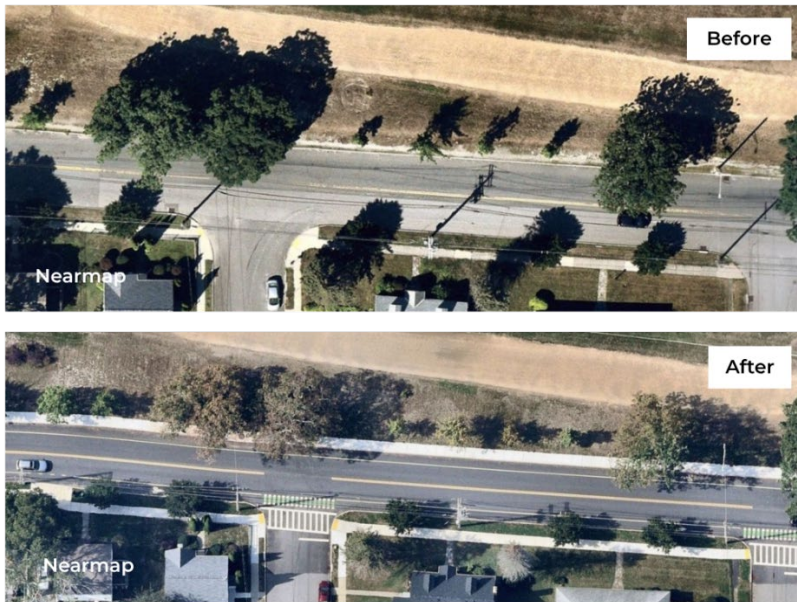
Before and after construction of sidewalk along Burncoat Street.
